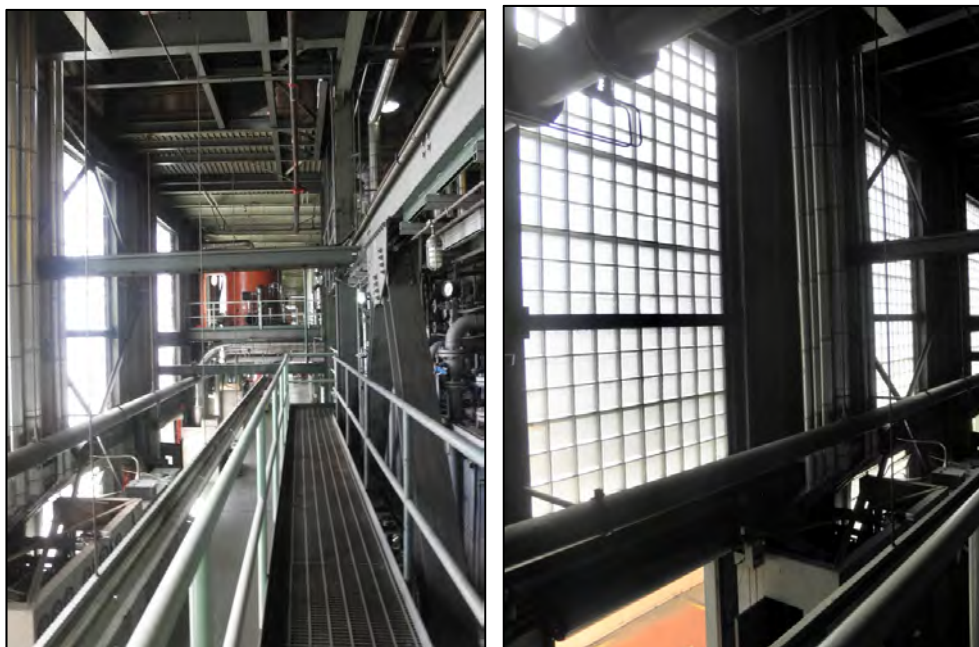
Grayson Boiler Building: Mezzanine, Looking Southeast (left); Structural Glass Block Windows on Northeast Elevation (right), Looking Southeast
